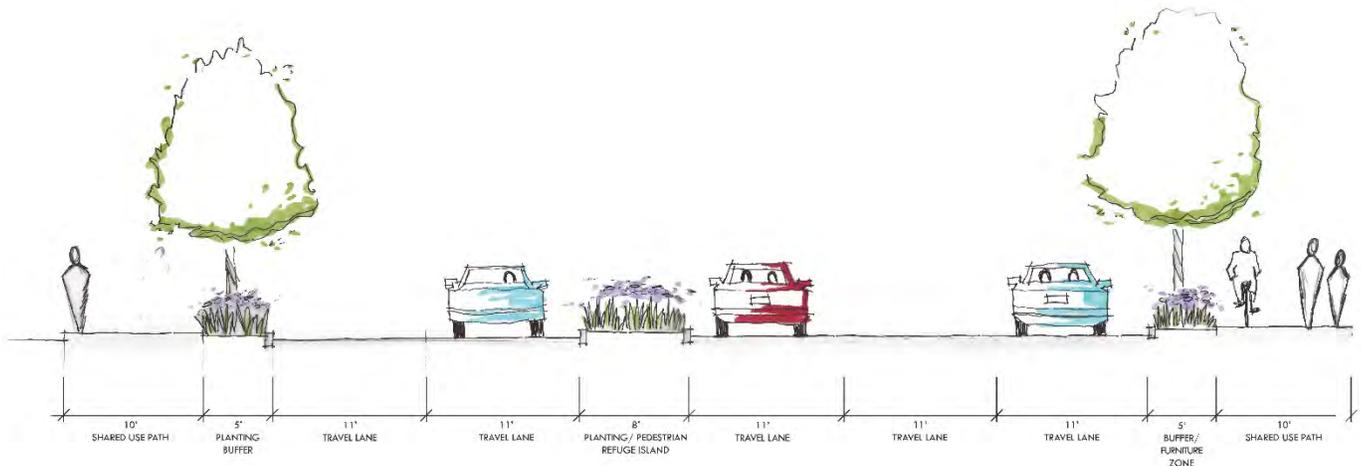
| Interstate District Recommended Typical Cross Section
